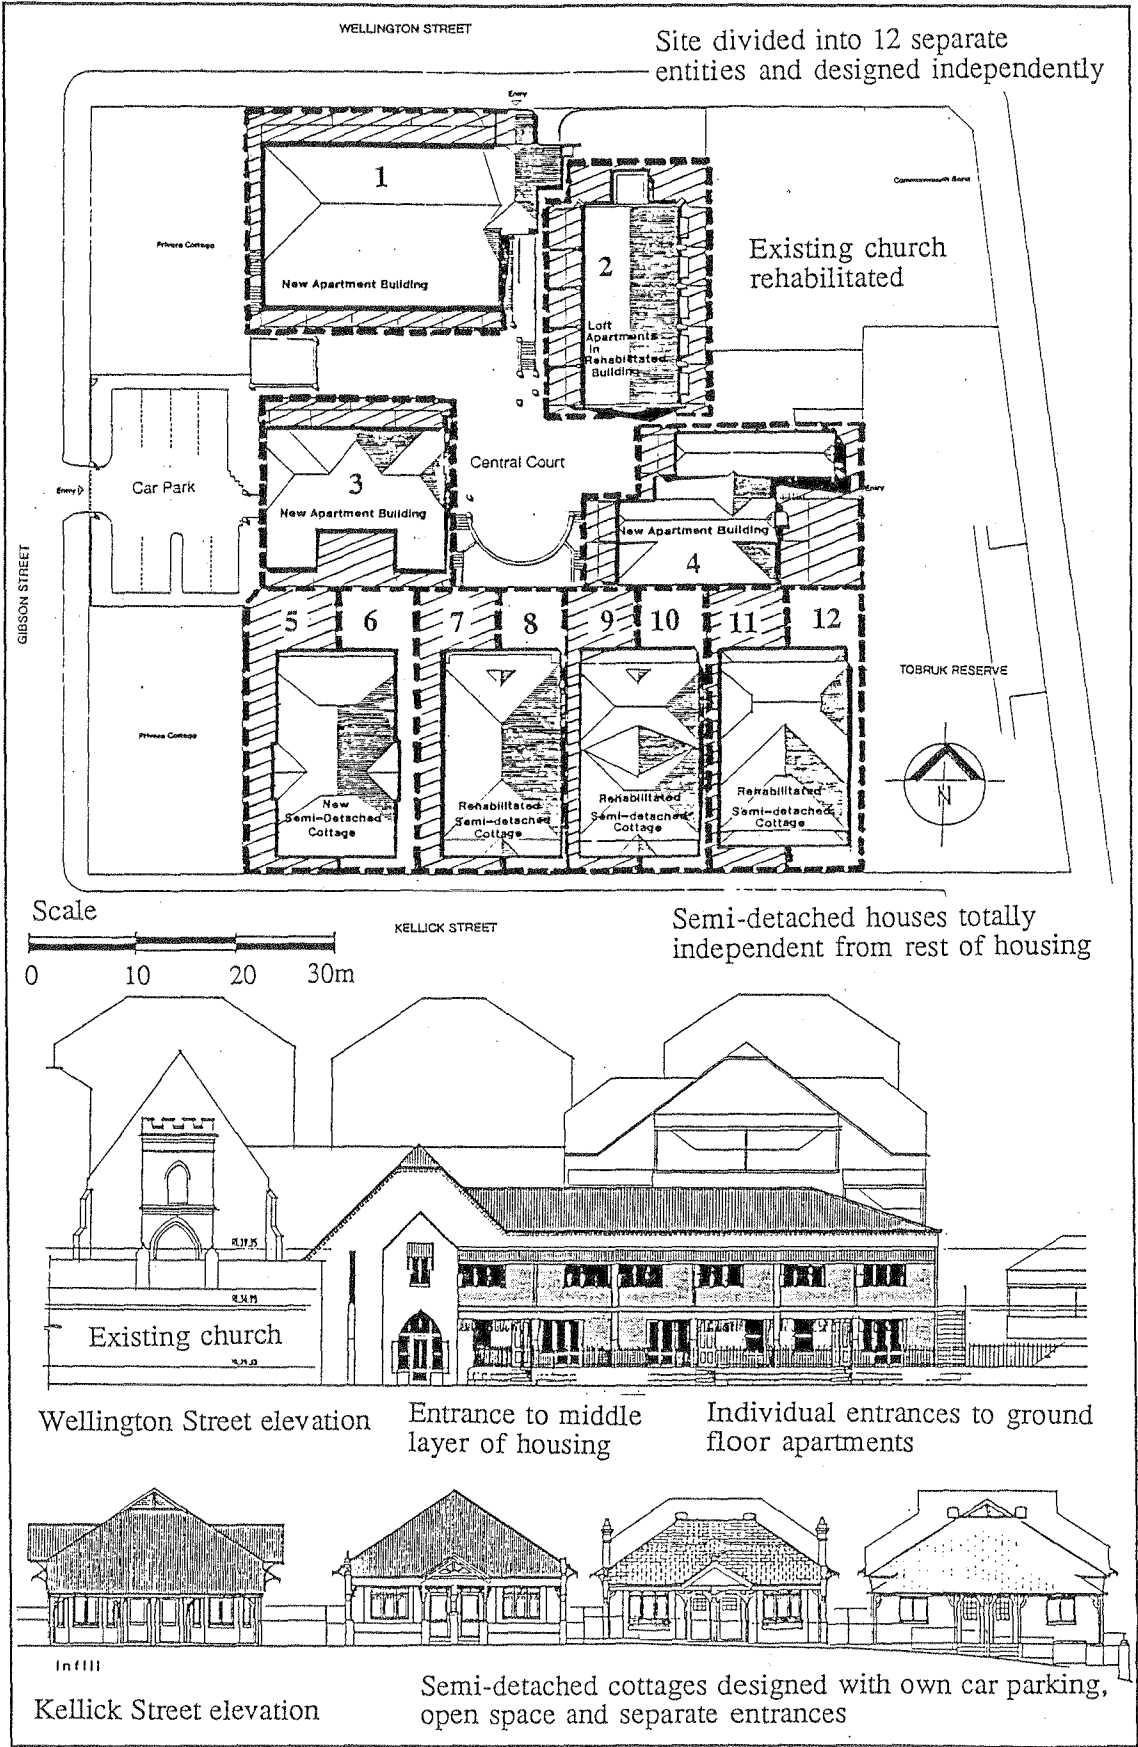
Site plan and elevations for Hungry Hill, Waterloo
